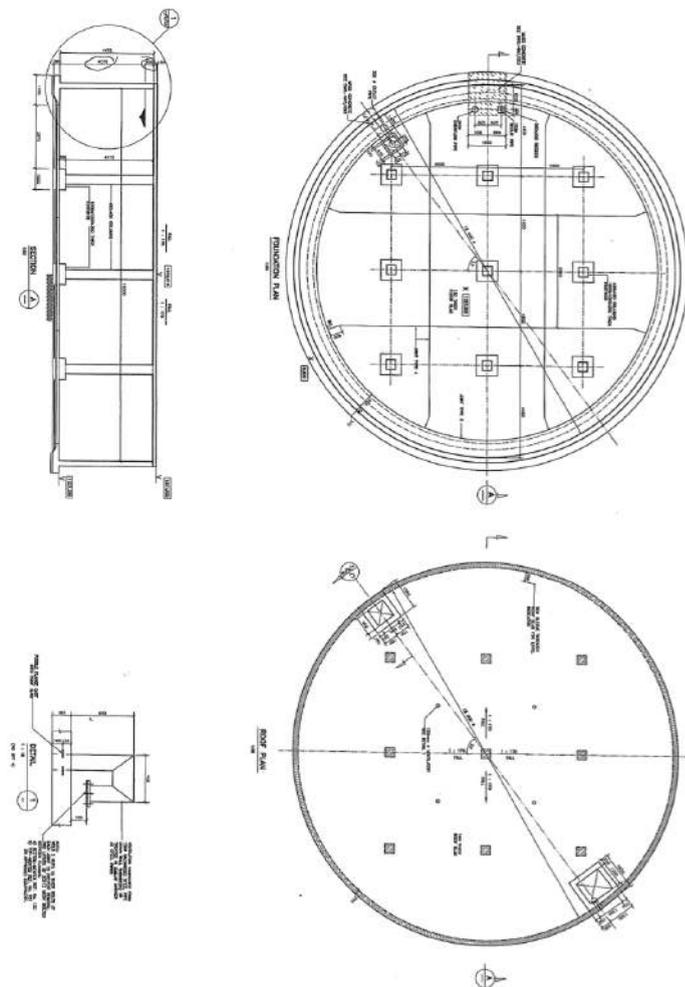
Beau Rivage 1 ML Reservoir - Floor Layout, Roof Plan Detail and Section [van Dalsen, 2014]
